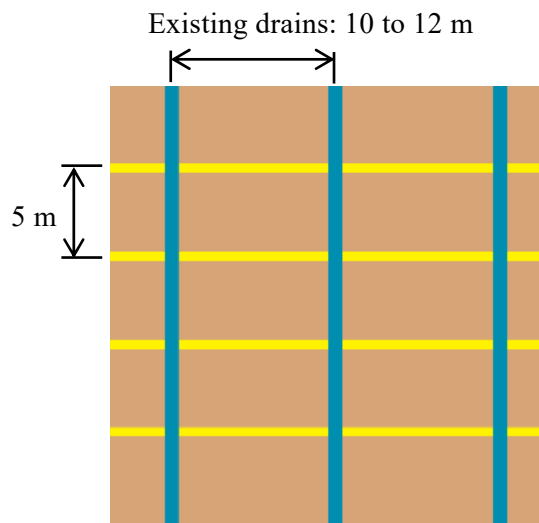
Example 1: Construction of Cut-soiler drains across the existing drains
